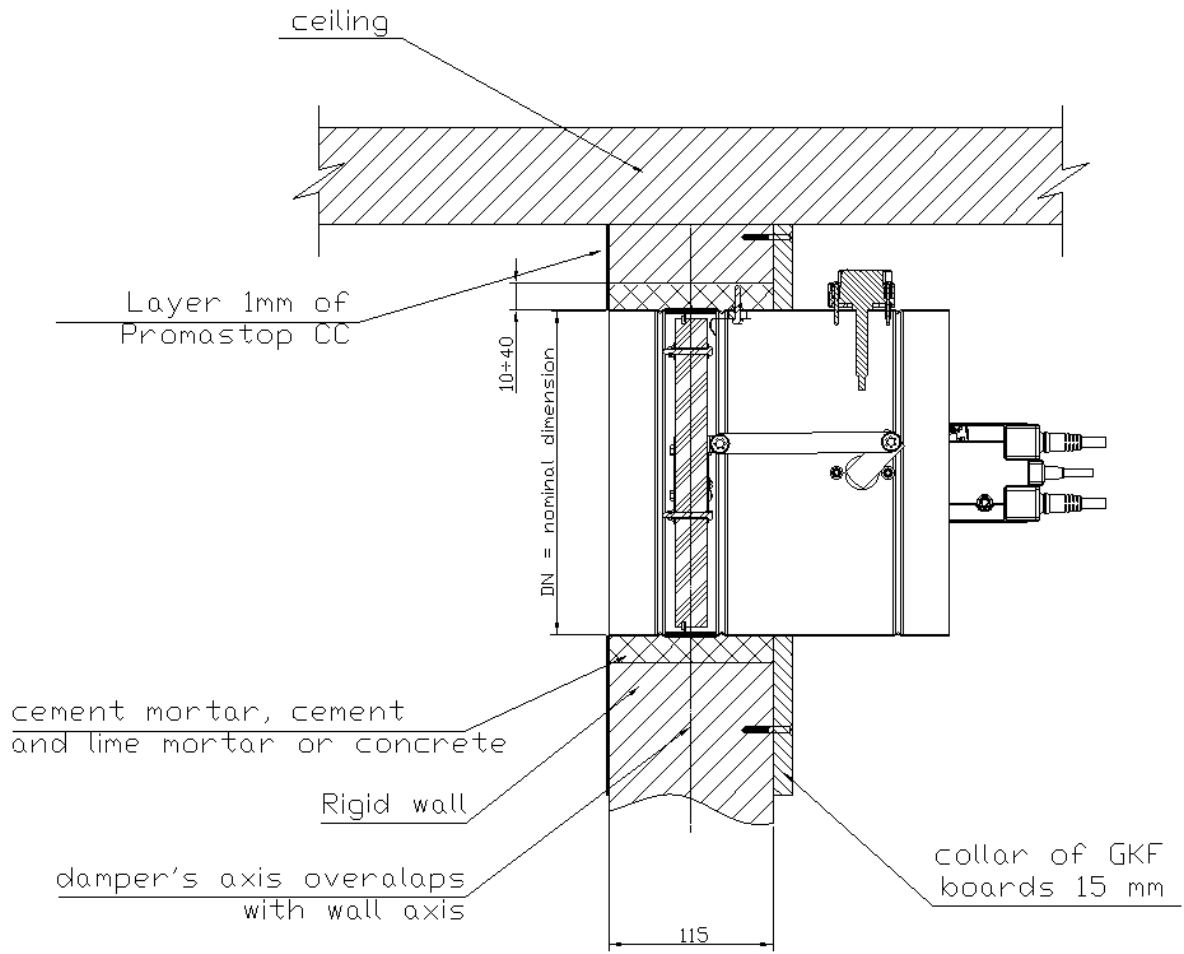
Installation method of KTM-O with minimum distances from adjacent fire dampers and from the ceiling.
